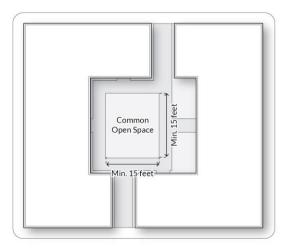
H.3.B: MINIMUM DIMENSIONS, COMMON OPEN SPACE
